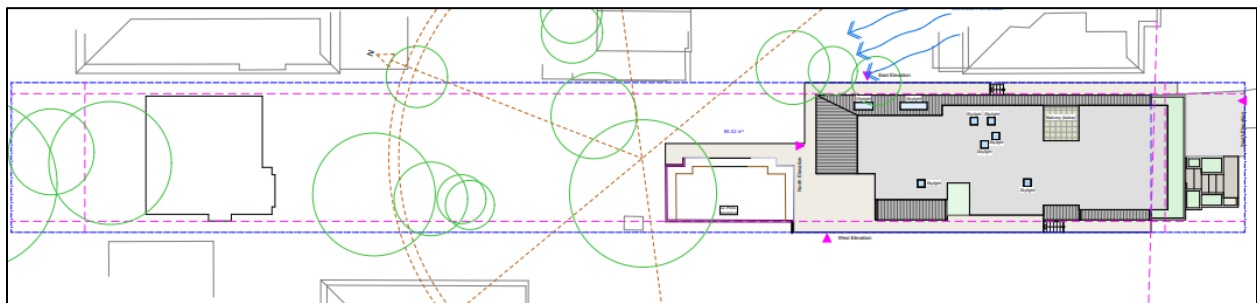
Post-Developed Site Plan (Source: Canvas Architecture & Design Pty Ltd)
